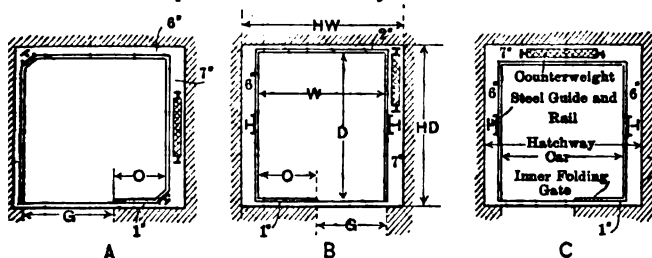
Typical Layouts for Elevator-hatchways and Car-platforms
